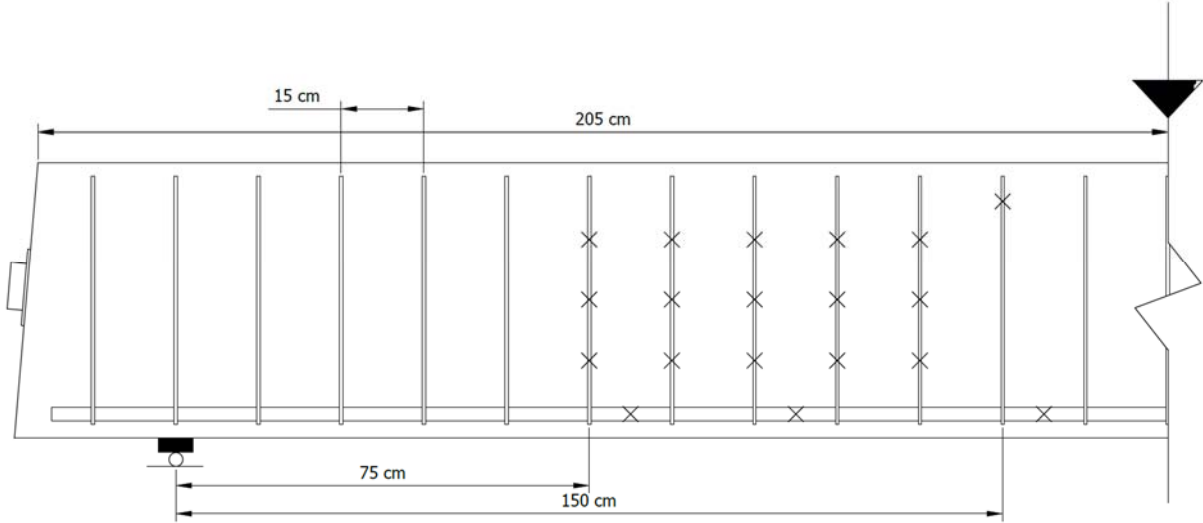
Strain gauge distribution for a 150mm stirrup spacing beam, on a long span shear test
